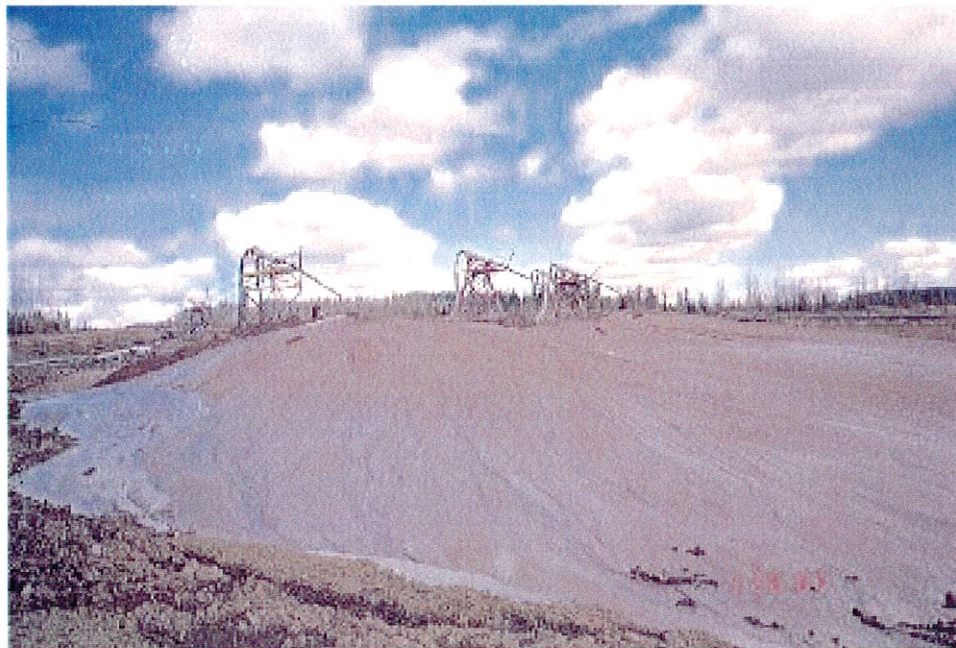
Cyclones (20 inch Krebs) in Borrow Area No. 4 stockpile.
